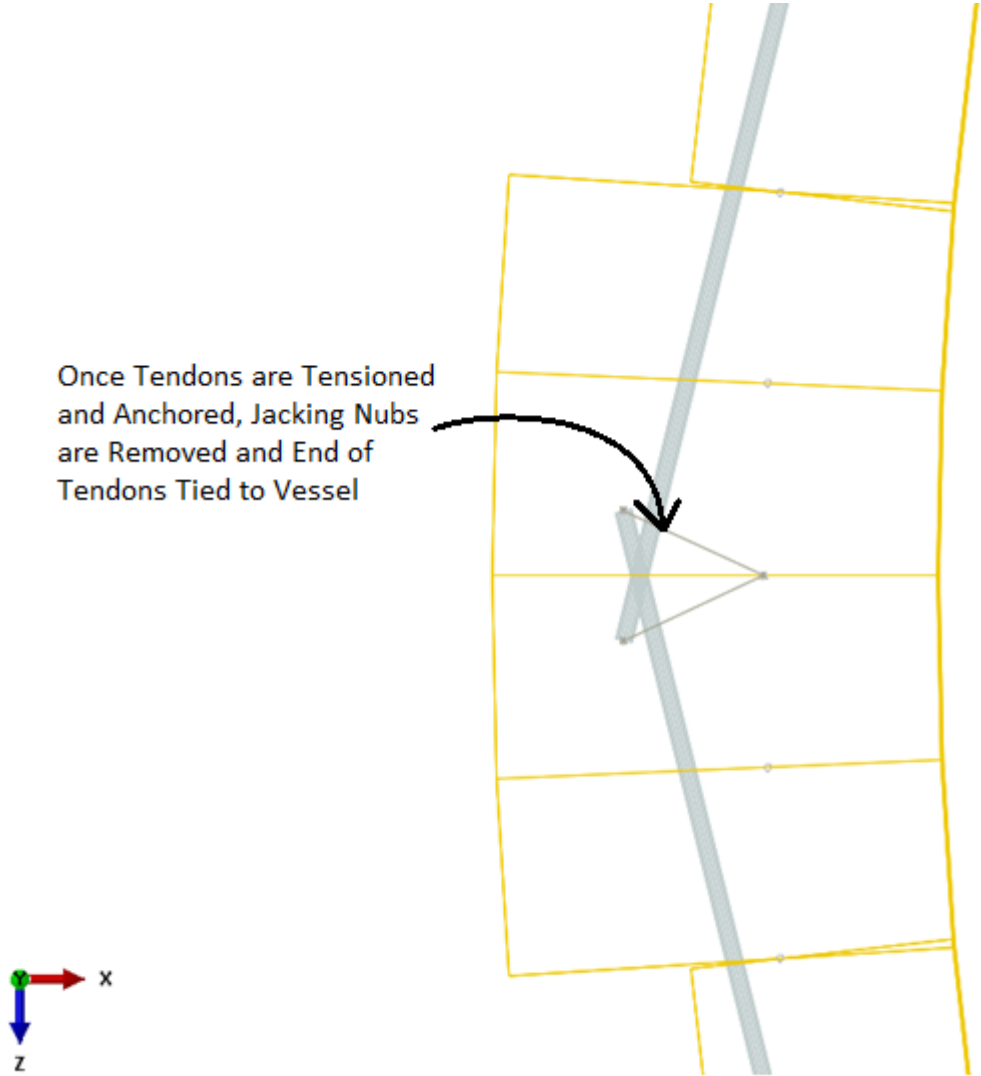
Deformed Shape of Hoop Tendon System After “Anchor Set Step”
